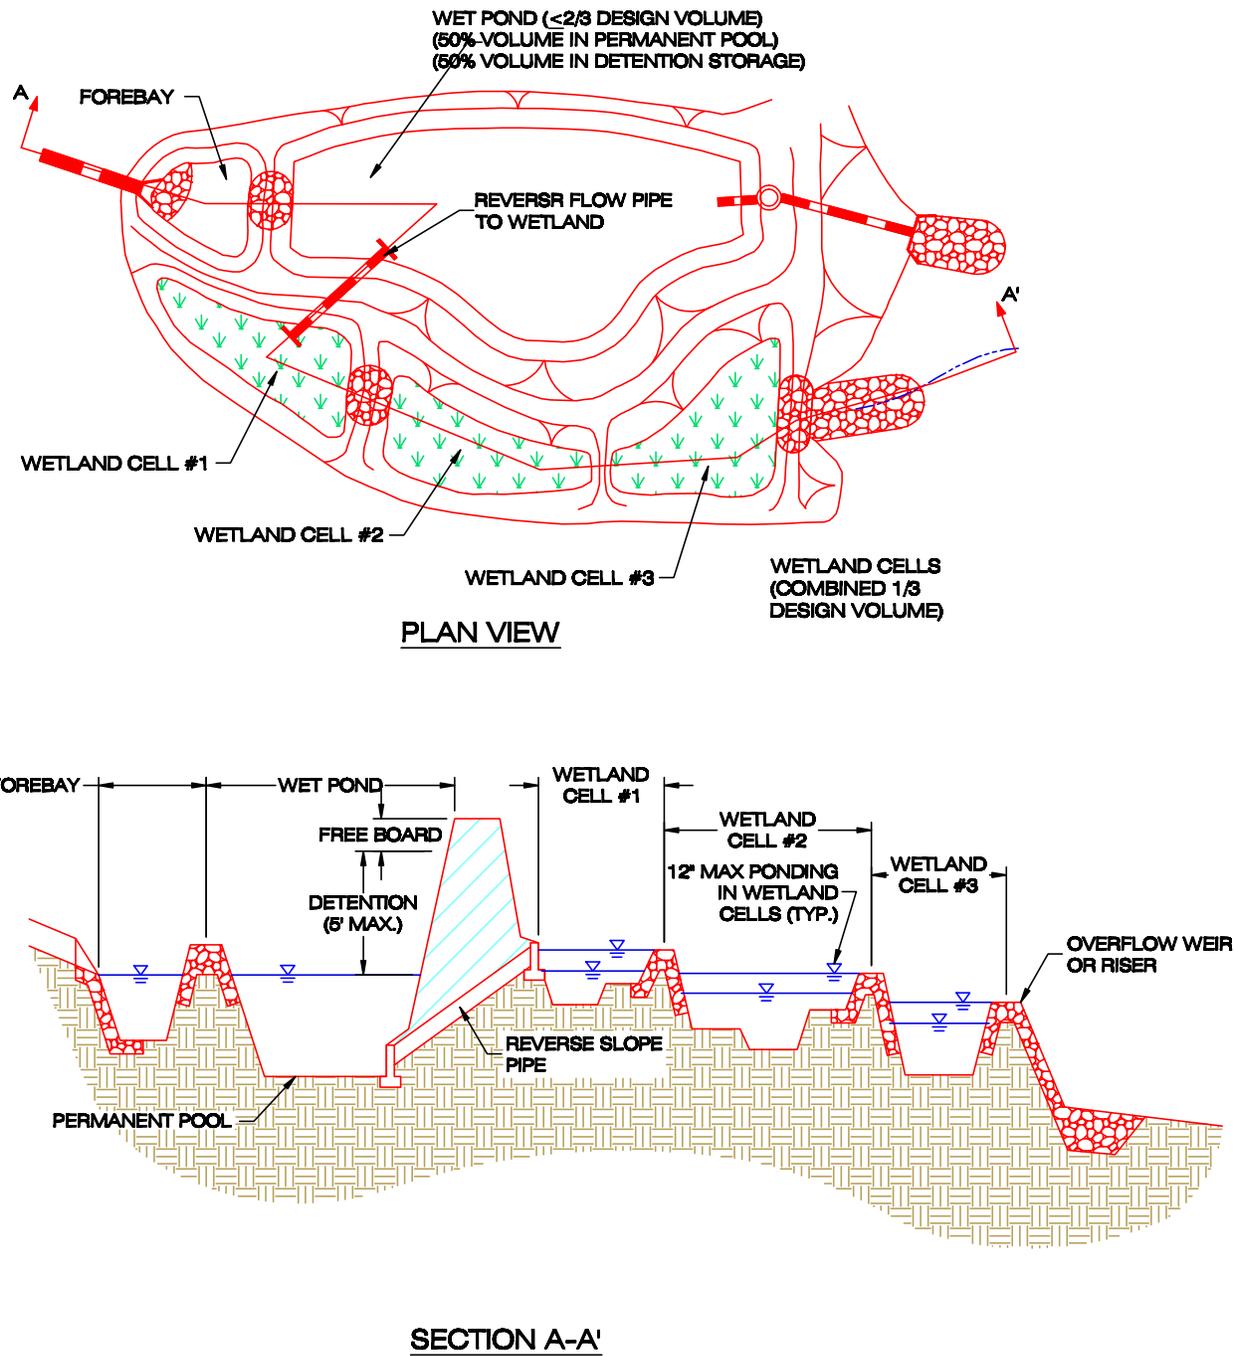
Typical Plan and Section for Pond/Wetland Combination
